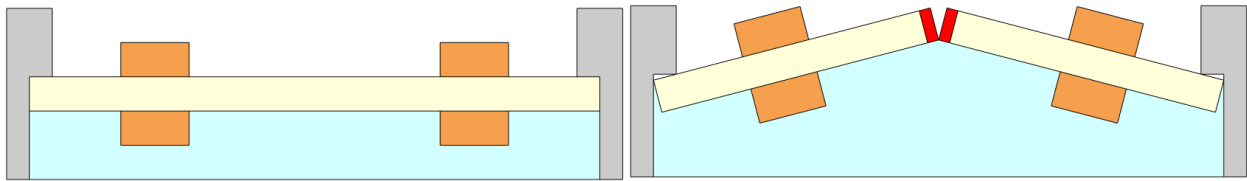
Leading failure mechanism of the koker door (A1_2) (Thijmen Jaspers Focks, August 2016)
